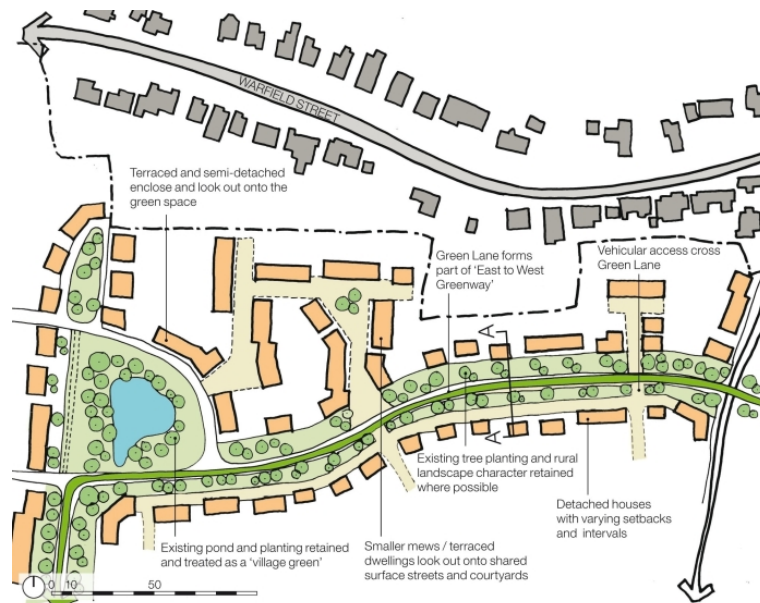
Detached and semi-detached dwellings on the green corridor should be set back from the carriageway with substantial informal planting
